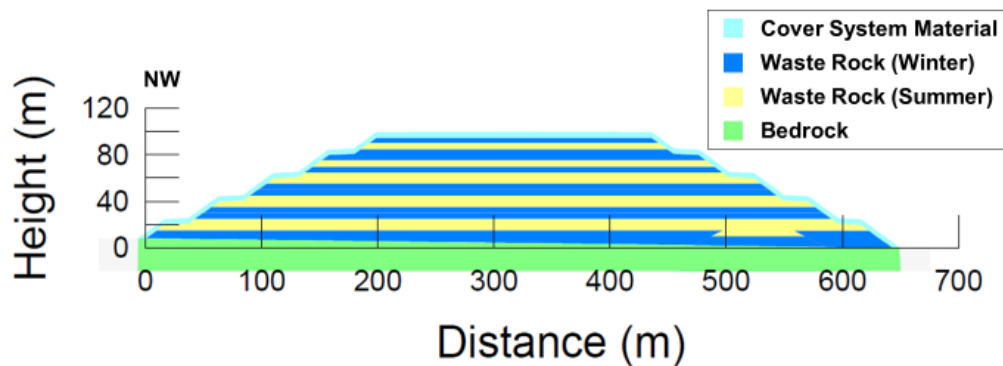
Northwest-Southeast cross-section through Whale Tail WRSF at closure (A).
